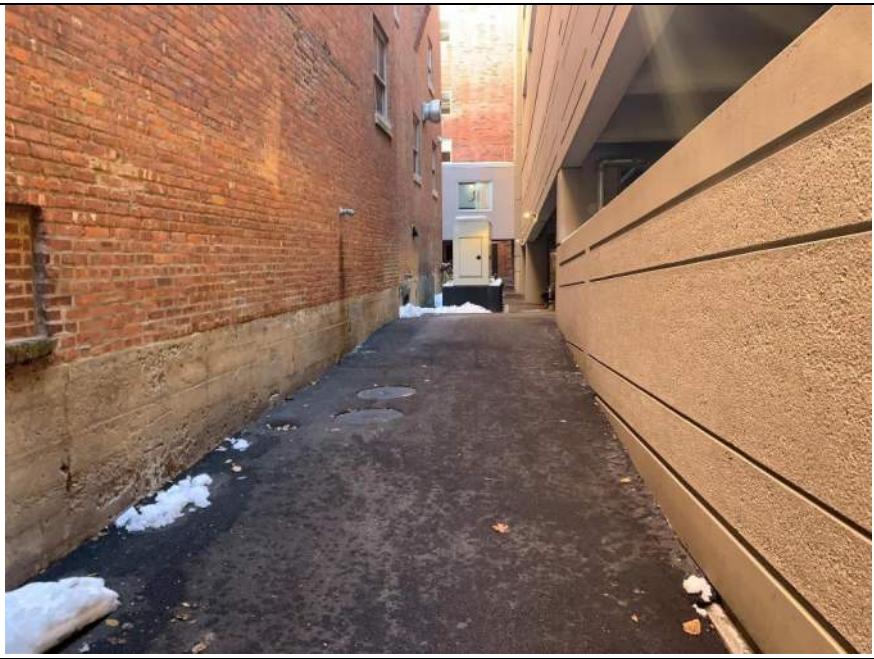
Looking northeast; paved surface cover in alley between 144 State Street and parking garage (12/14/22).
